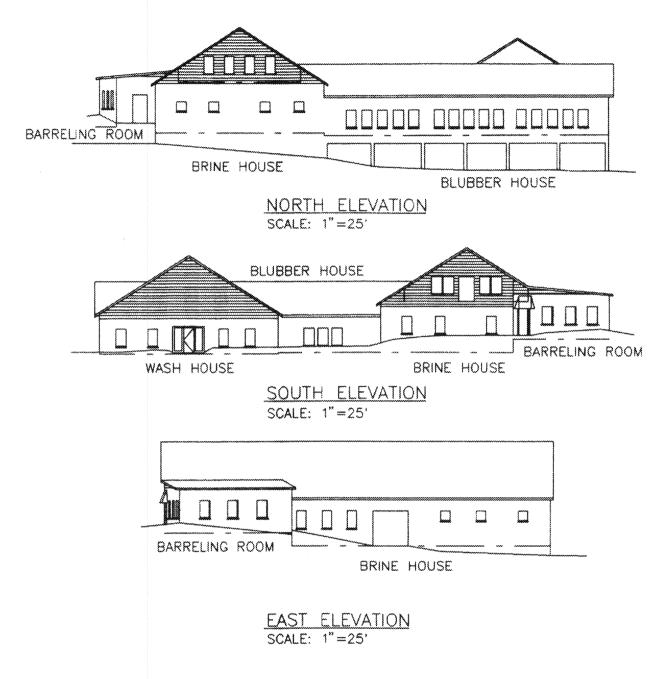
These three elevations show the building as it was originally built, except for the four north upstairs windows in the attic above the brine house, and the garage door penetrating the east wall of the brine house.
